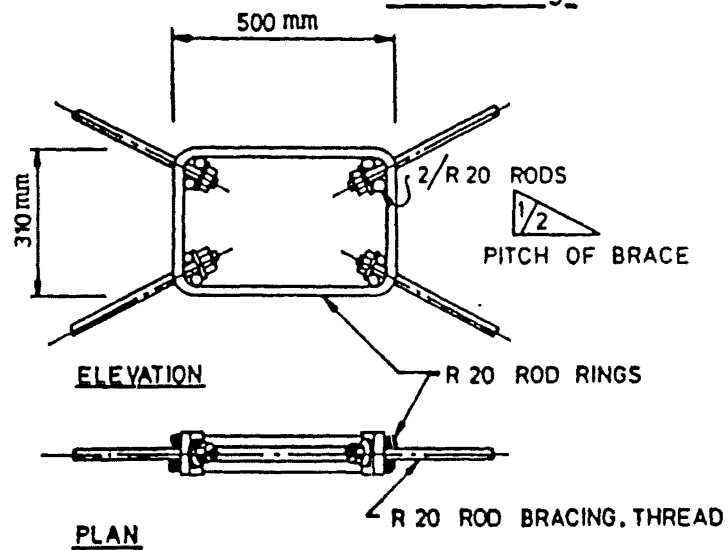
Detail of a yielding steel bracing system in a building in New Zealand (Tyler, 1985)
